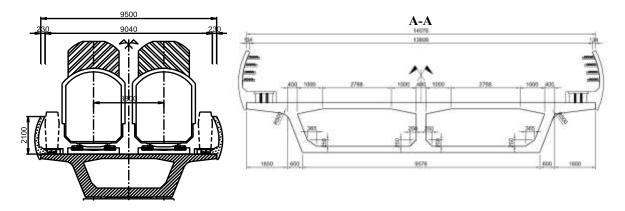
Cross Section of Box Girder for Standard Viaduct
